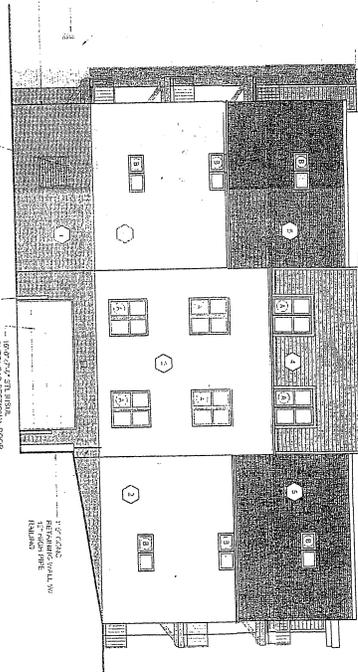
EXHIBIT "B" – PROPOSED BUILDING ELEVATIONS
